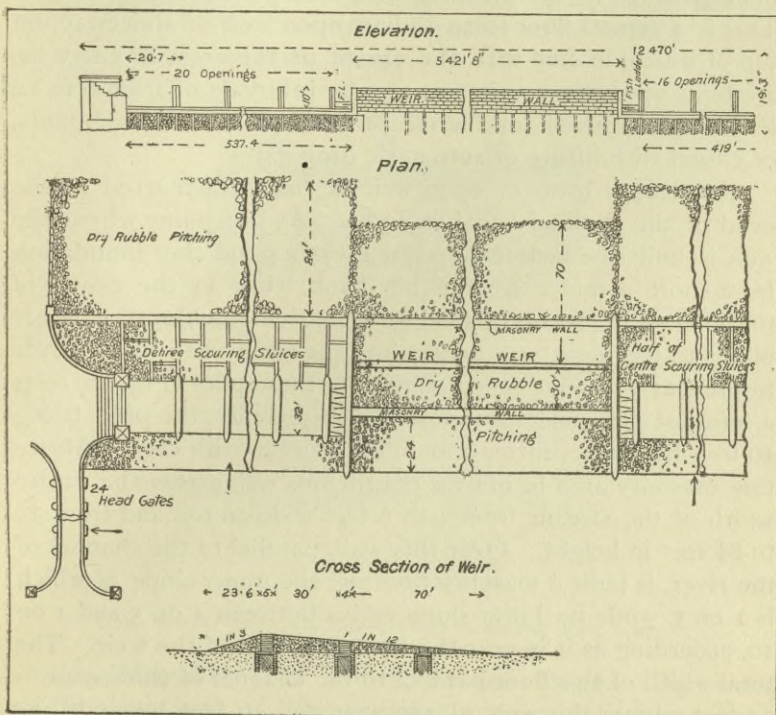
HALF-ELEVATION AND PLAN, AND SECTION OF SOANE WEIR, INDIA.
